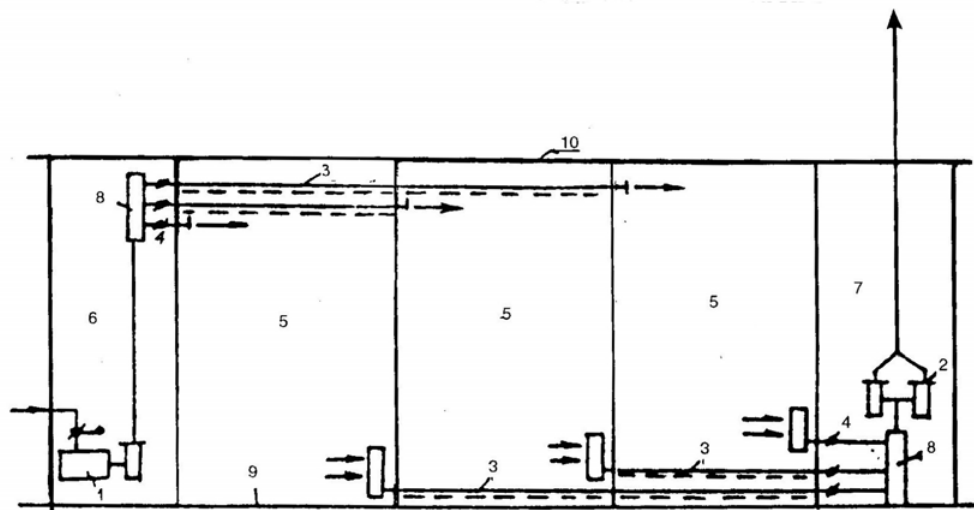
Layout of air ducts in the production building with middle corridors.
